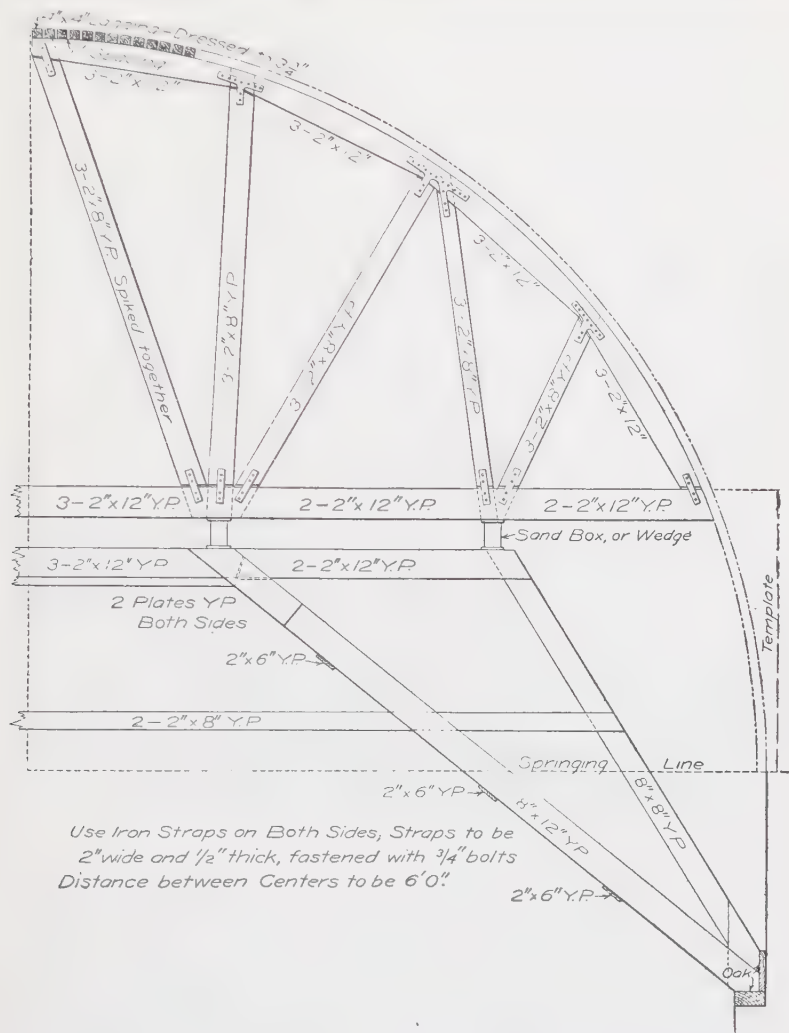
Framing of Centers for Stone Arch Bridge over Rocky Creek,
